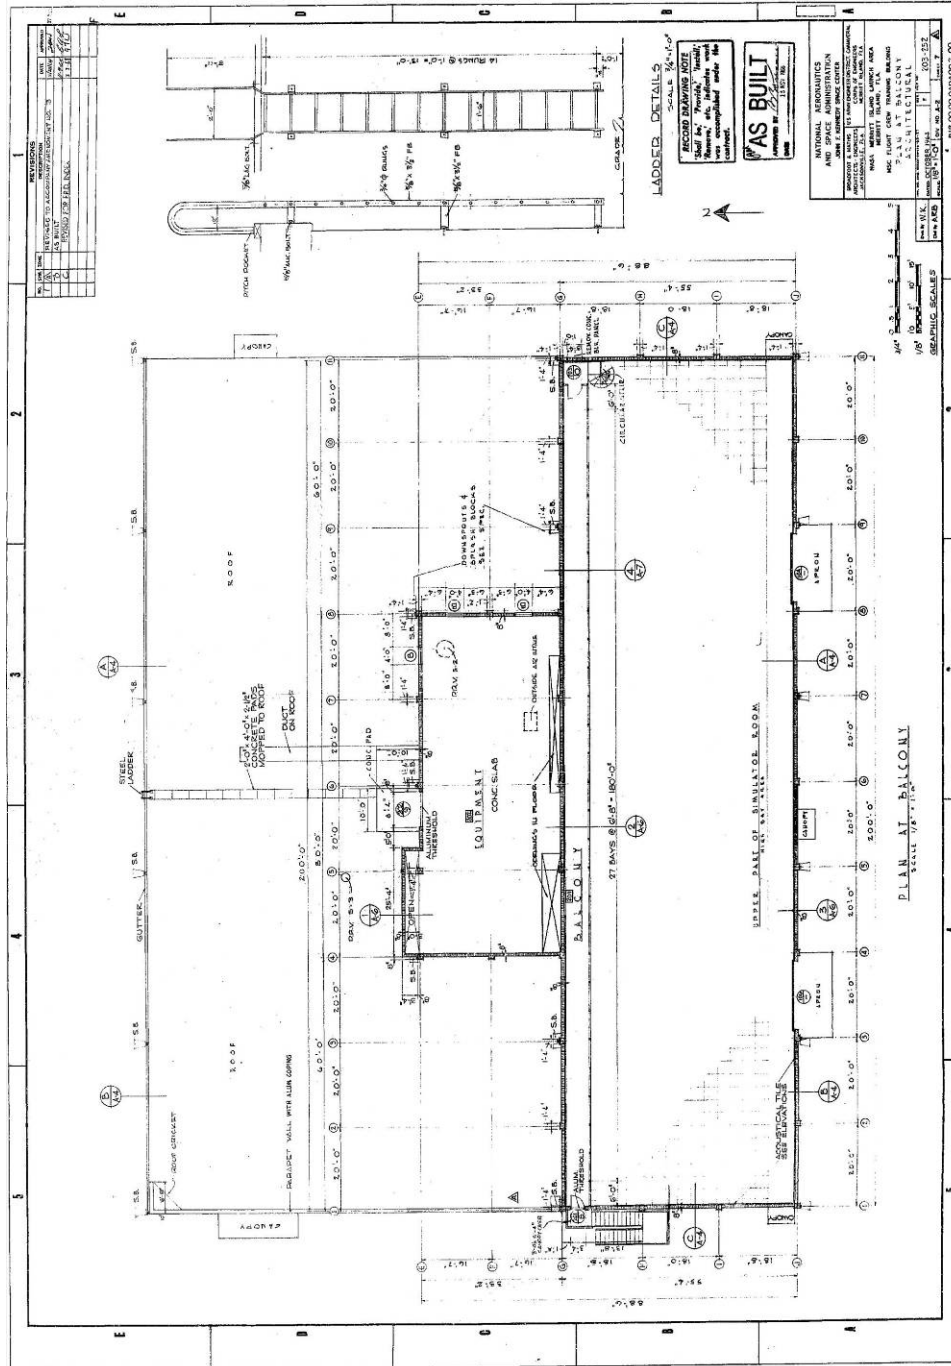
Broadfoot & Mathis, Flight Crew Training Building, Plan at Balcony, October 1964, Sheet 7.
